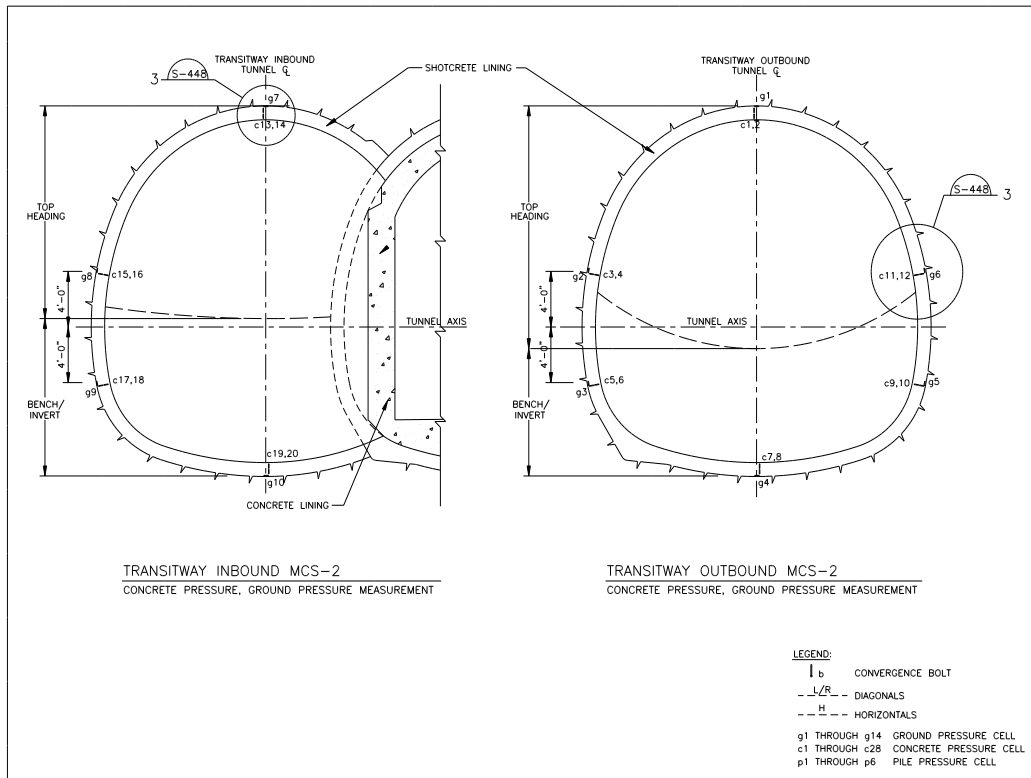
Monitoring Cross Section 2 - Concrete Pressure and Ground Pressure
